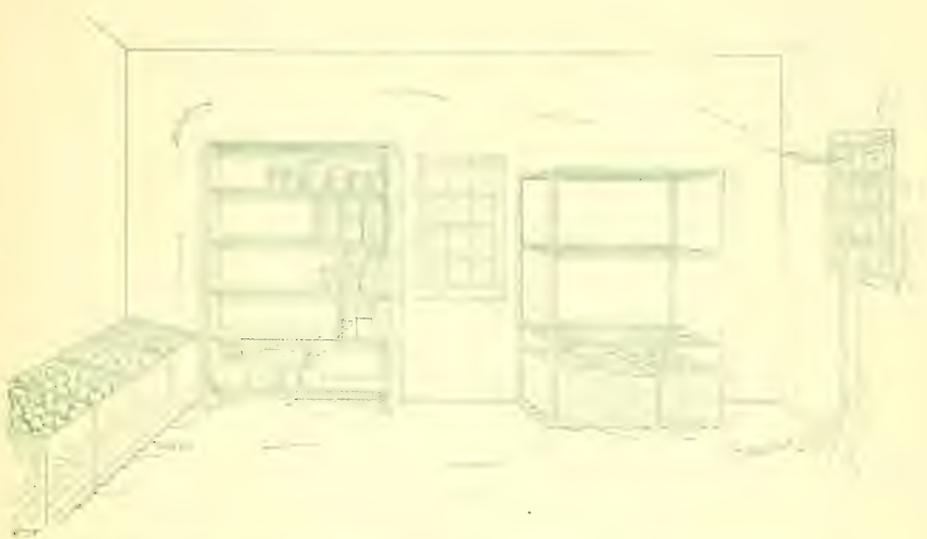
This suggests an arrangement for storage in a cool cellar. An earth floor is best, as it gives off some moisture. If the floor is of concrete it should be covered with 2 or 3 inches of sand and this should be sprinkled with water occasionally. In the drawing the pane in the upper right hand corner of the window is shown to be missing. This is to allow the escape of heated air. In severely cold weather close this opening. The stove pipe fitted into the place for one of the lower panes admits cold air. Instead of a stove pipe a wooden flue, made of old boards or parts of boxes may be used. Bins and boxes should be placed on slats to lift them from the floor and allow circulation. For this same purpose bins and boxes should be at least one or two inches from the wall. Air holes bored in sides and bottom of bins and boxes help circulation. Protect glass jars from light.
